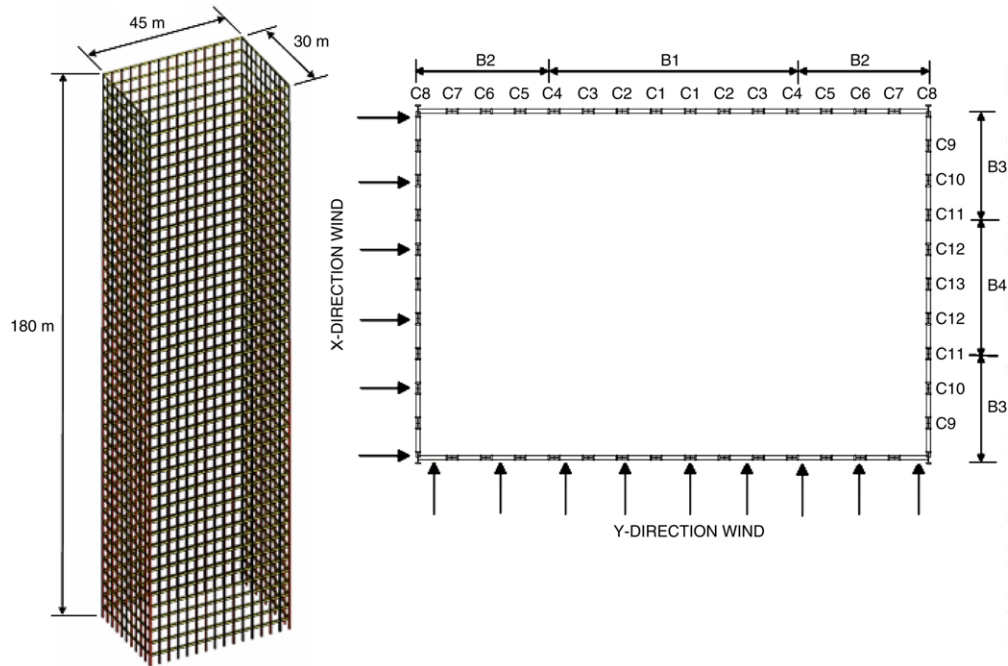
45-story steel building framework example with beam (B) and column (C) grouping.
